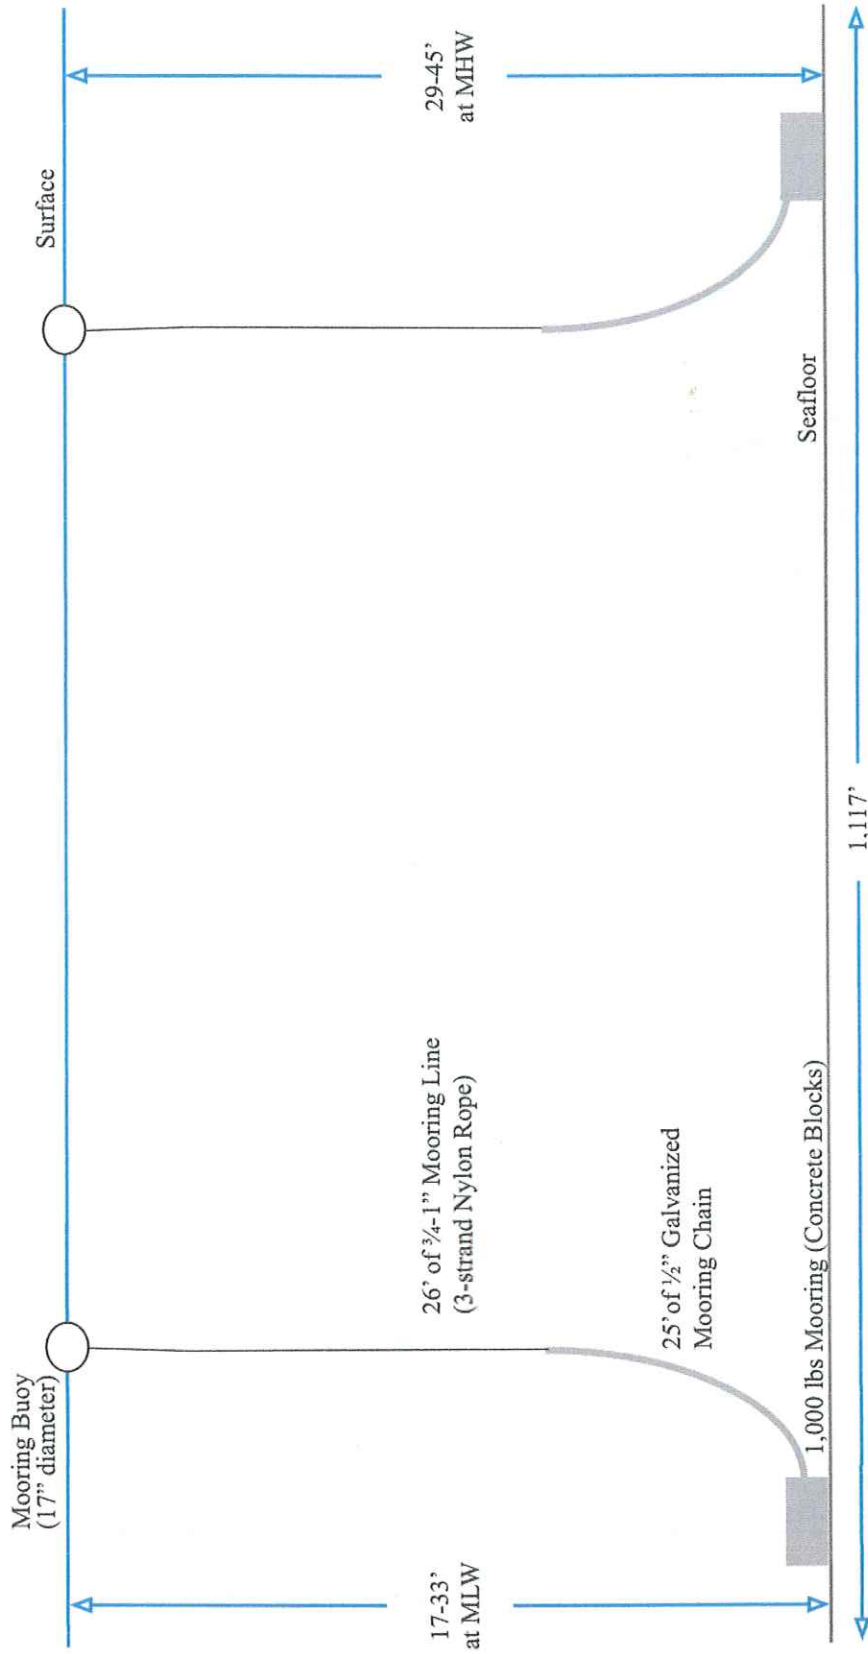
Section 7 E - Equipment Layout: Northern edge of proposed lease looking south
